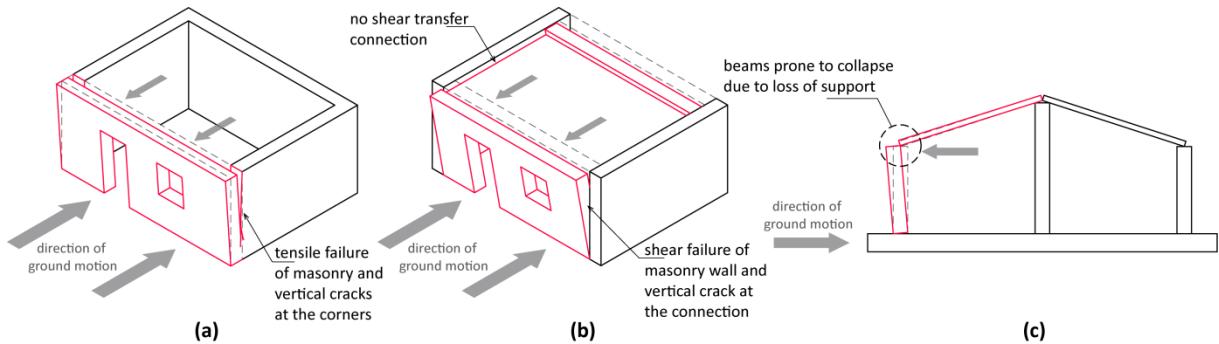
(a) Global overturning of the external walls; (b) lack of anchorage between walls and horizontal diaphragms leading to the toppling of walls; and (c) separation of floors and roofs from the walls
